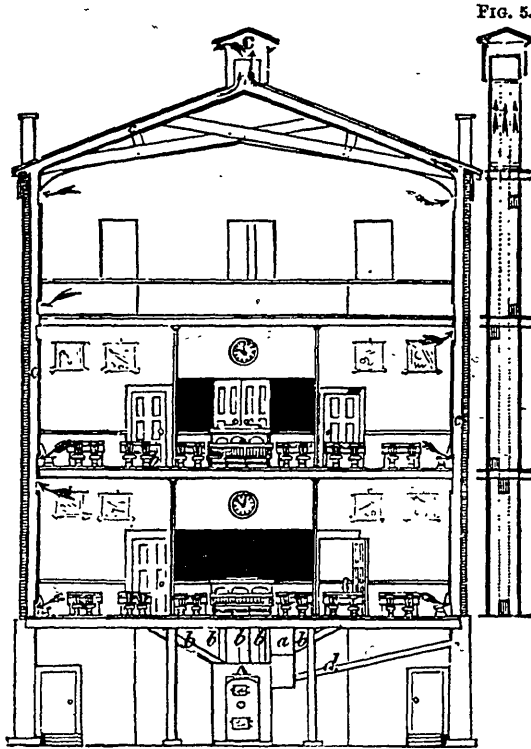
SECTION OF SCHOOL-HOUSE.
